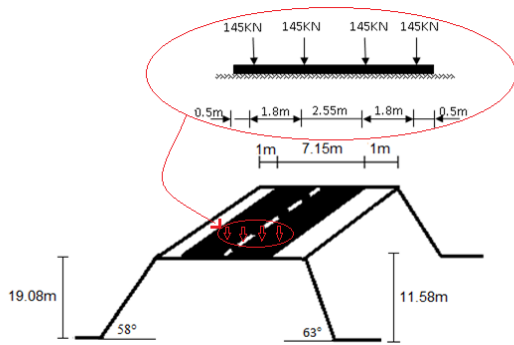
SHOWING THE SLOPE DIMENSION OF ROAD EMBANKMENT (FILLING MATERIAL)
